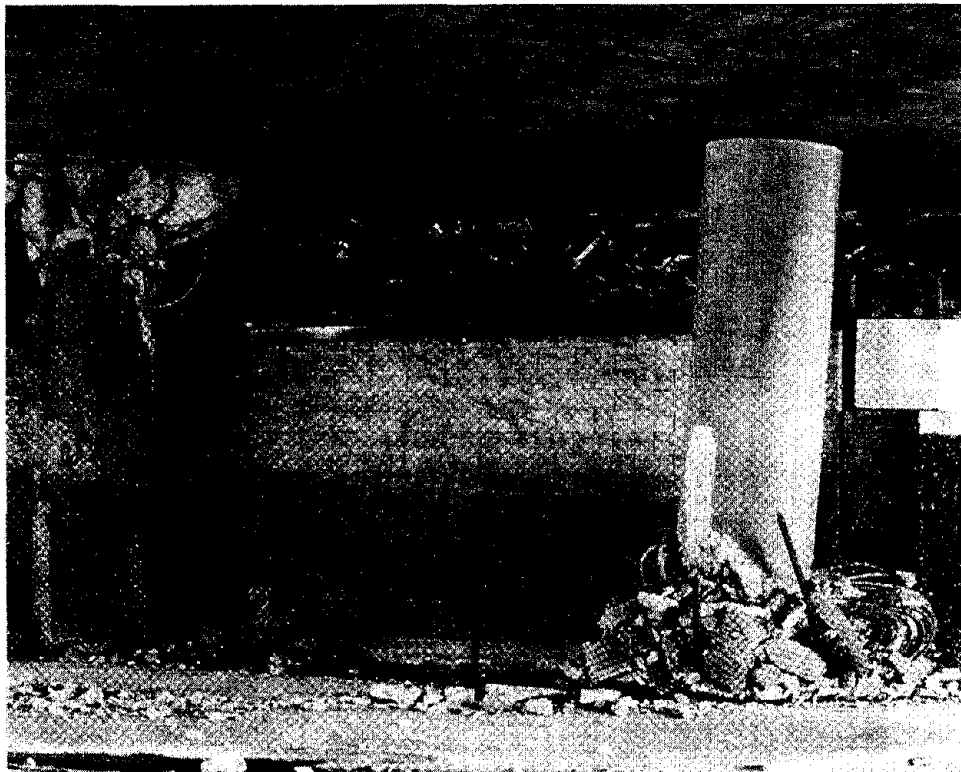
Failed piers in Bent 7 supporting westbound lane of I10 at Venice Blvd.
